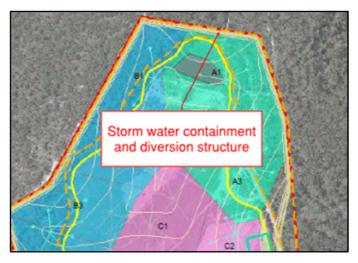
existing approved plan (appendix 3) showing the proposed location of the diversion structure.
